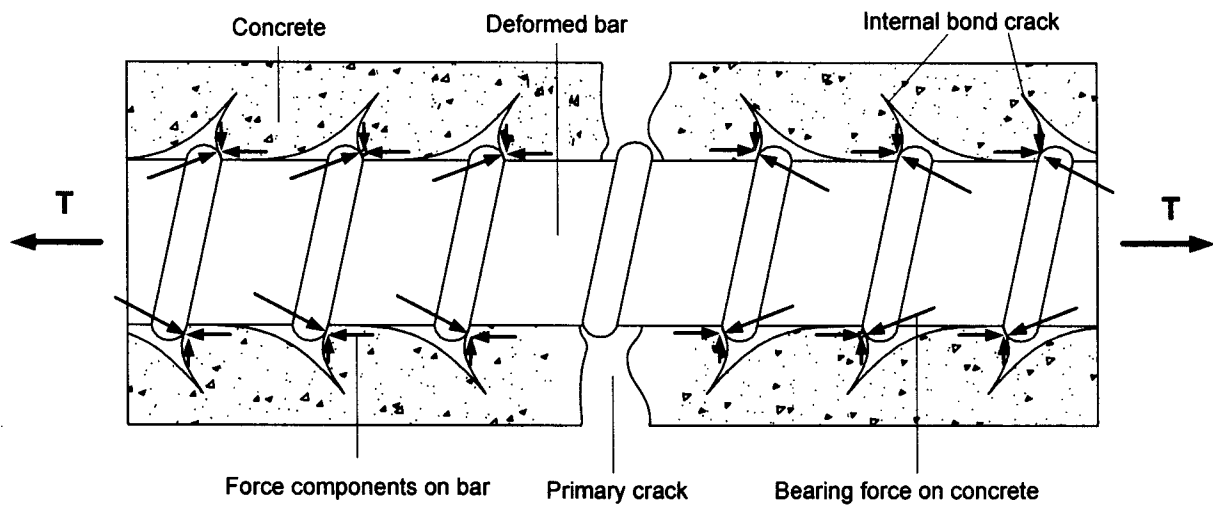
Internal cracks arise from pullout of deformed reinforcing bar (Goto, 1971)
